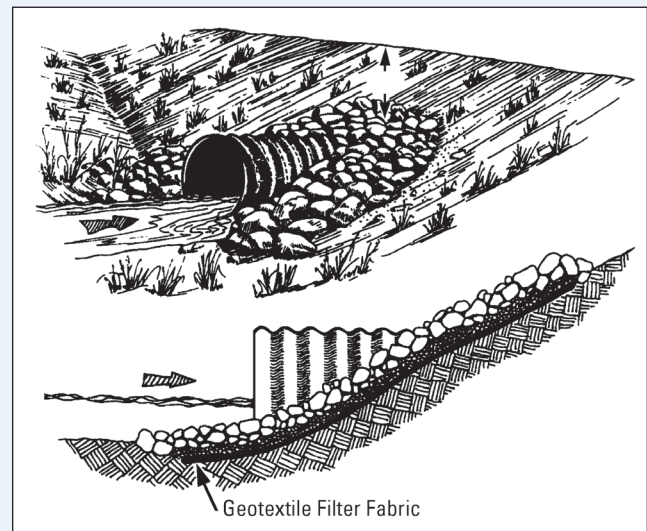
Use riprap around the inlet and outlet of culverts. (Figure Credit: WDNR)
